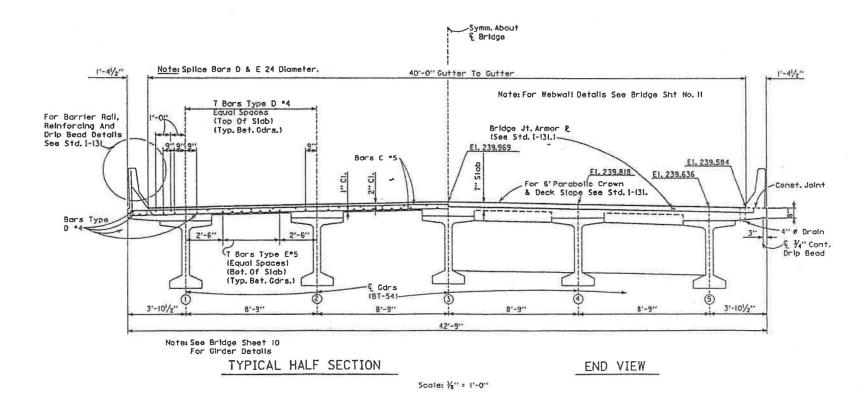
Cross Section of the Uphapee Creek Bridge
